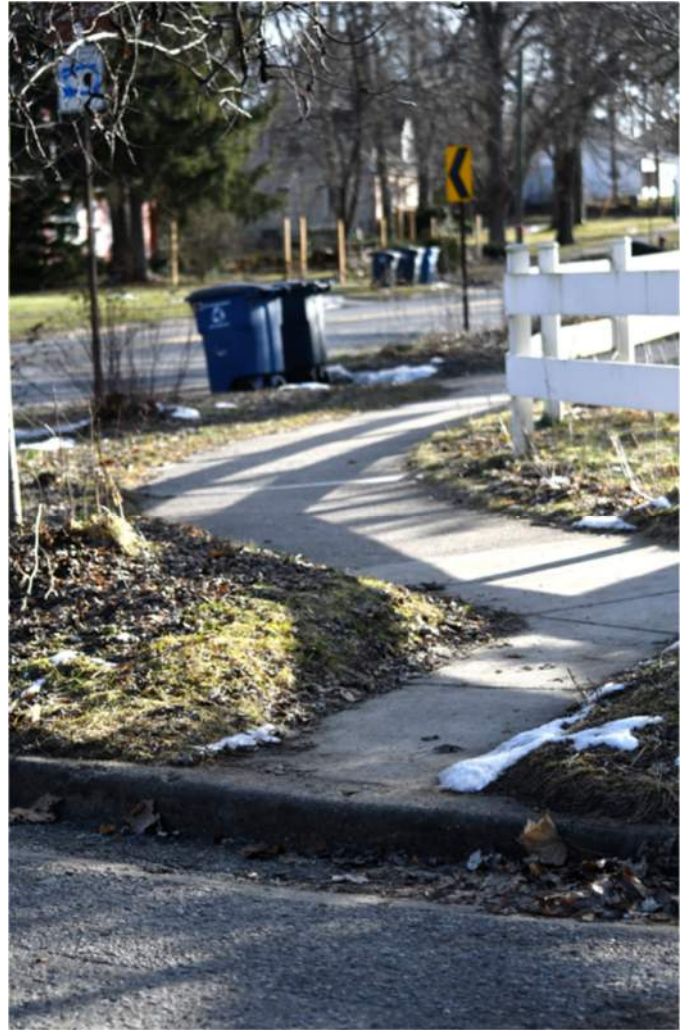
Sidewalk Crossing Without Accessible Ramp and Detectable Warning
